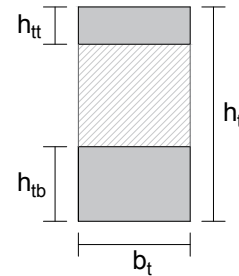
Cross-sectional view of the open truss girder in y-direction
